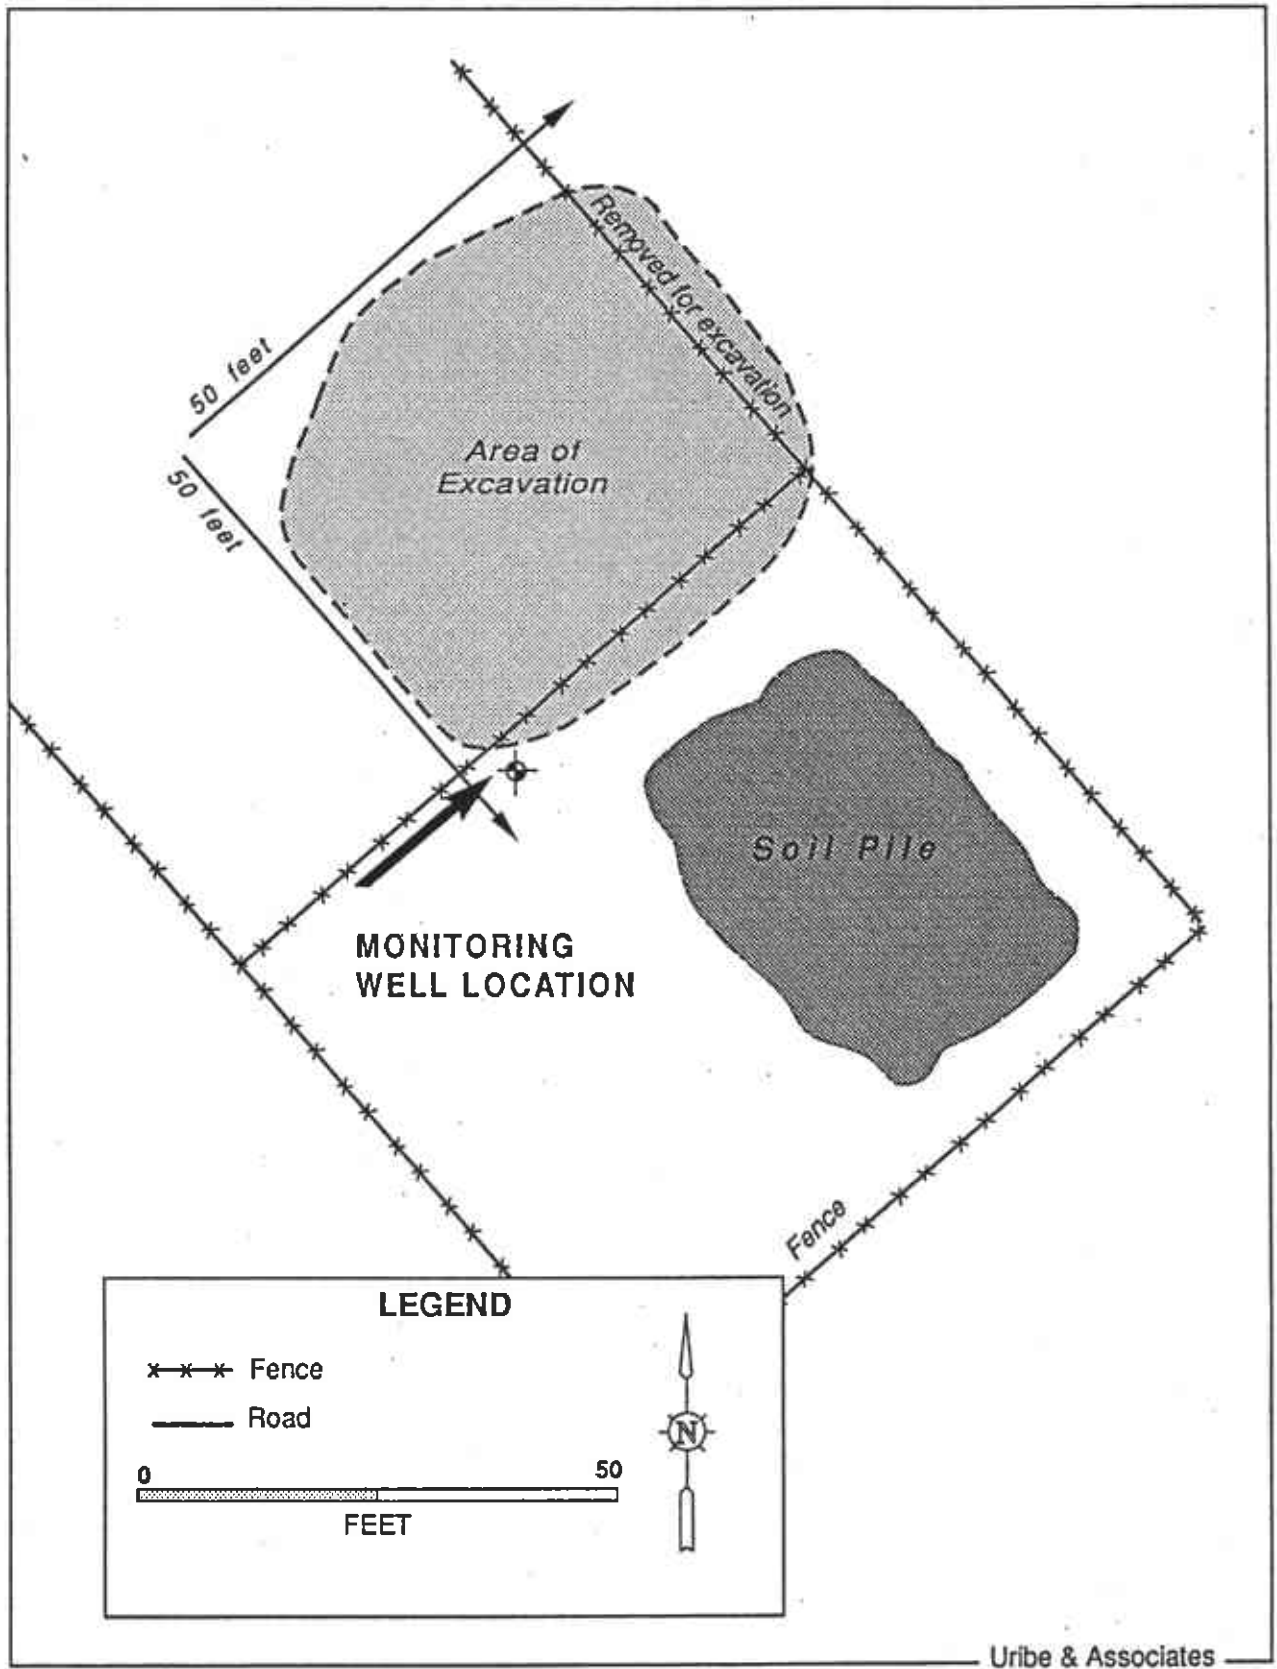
Excavated Pit, Soil Pile, and Proposed Monitoring Well Locations
